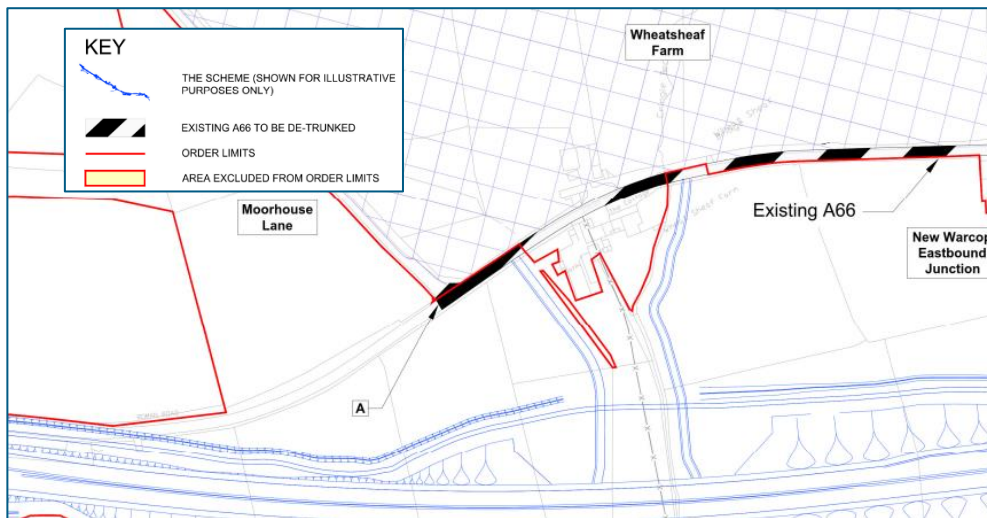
(i) Extract from De-Trunking Plans (Before)
